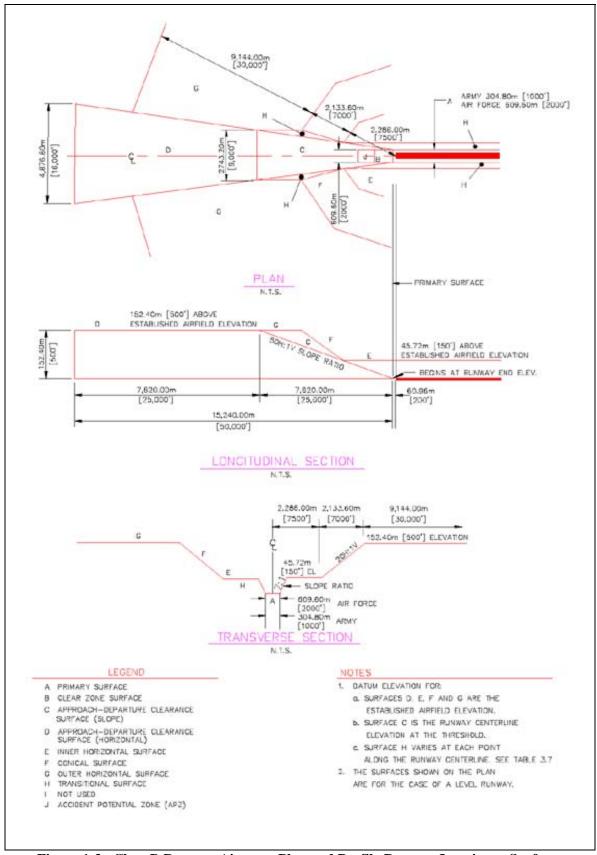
Class B Runway Airspace Plan and Profile Runway Imaginary Surfaces
